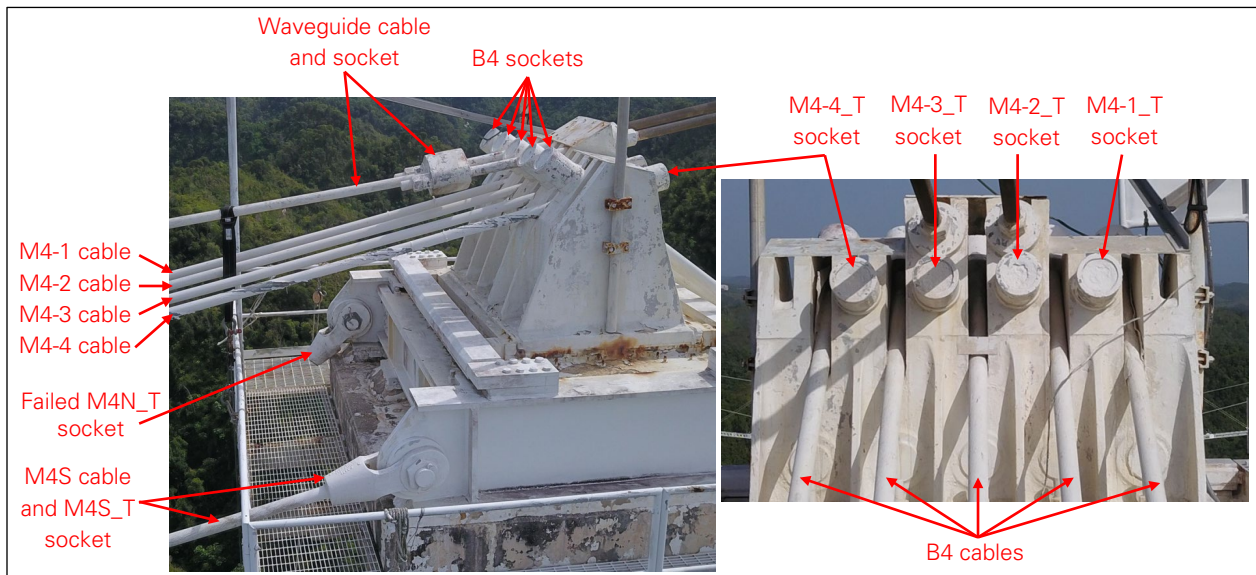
Cables and sockets at top of Tower 4 after M4N failure, looking northeast (left) and northwest (right)
